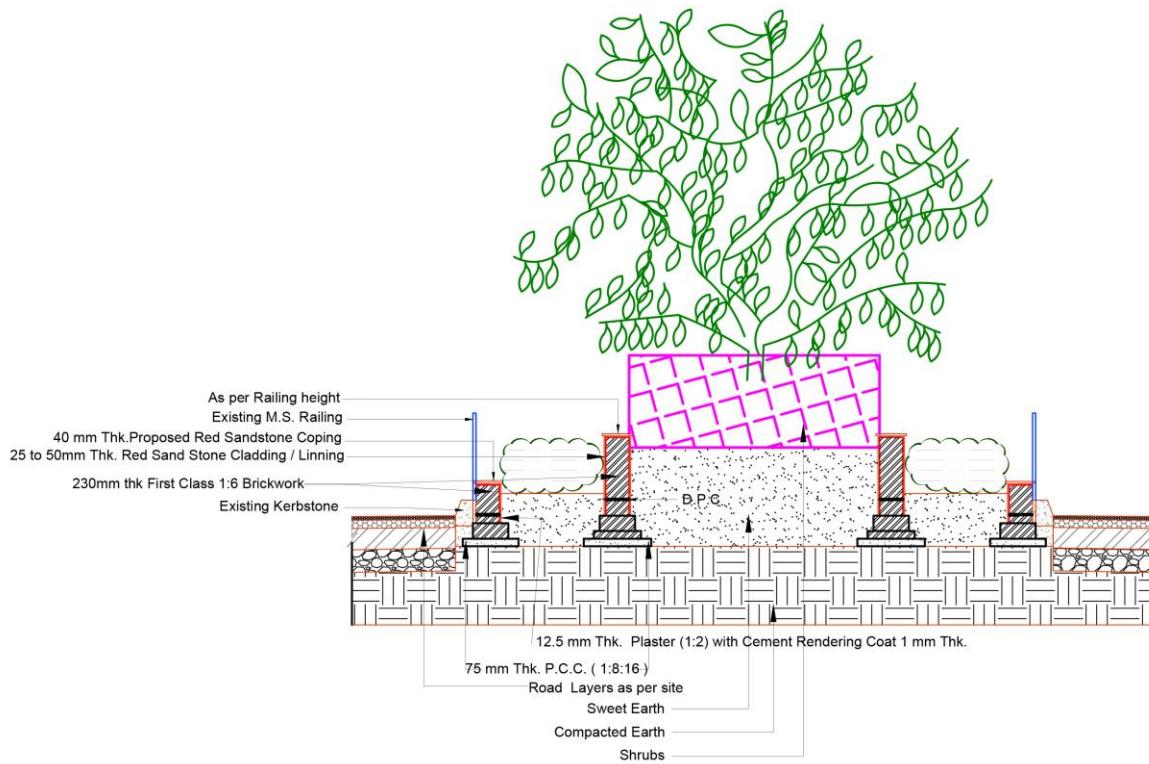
Proposed wall and planter wall near existing railing below Elevated loop on GT road
